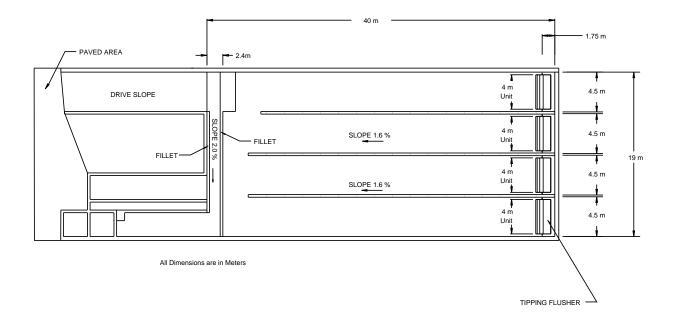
Wheeler Avenue - CSO Storage Tank, Plan View
